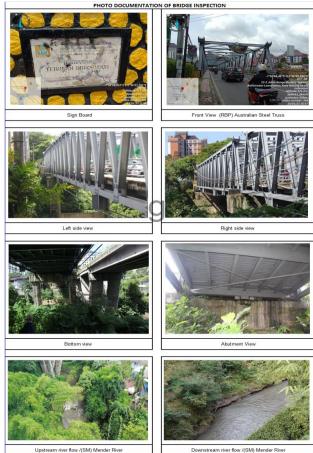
Existing Condition of inventory inspection of steel truss bridges
